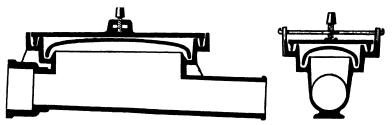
Sections of cast-iron deep channel with double-seal cover, wroughtiron bridle, gun-metal screw and lifting rings.
